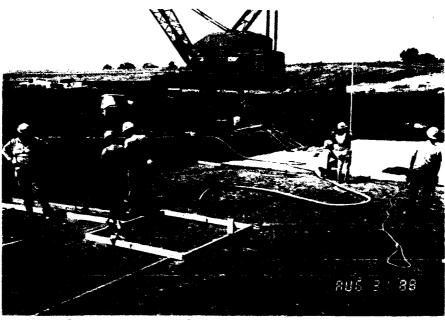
Foundation of spillway wall footing R-14. R-15 is covered by protective concrete. Note: Board angle seen here is <u>not</u> that of previous photos. Previous form board angle is beyond stacked shovels on concrete in this Photo.
